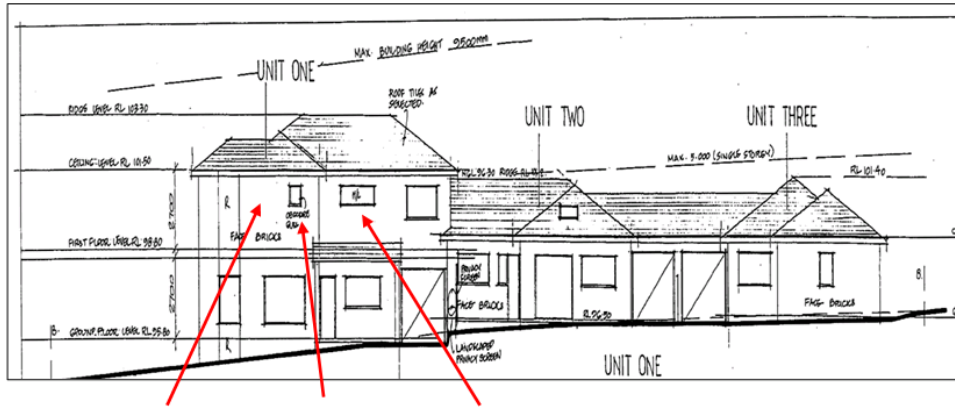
Window removed, obscure window, highlight window, South Elevation amended plans dated 15 August 2019
